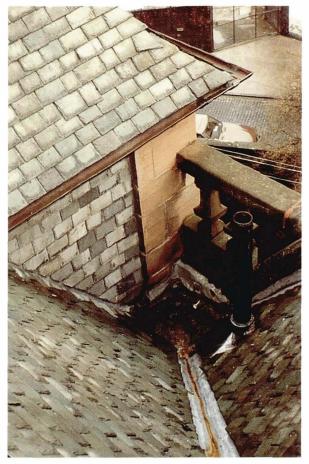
A blocked and inaccessible roof outlet. Lack of maintenance combined with inaccessibility resulted in a dry rot attack in adjacent timbers.
